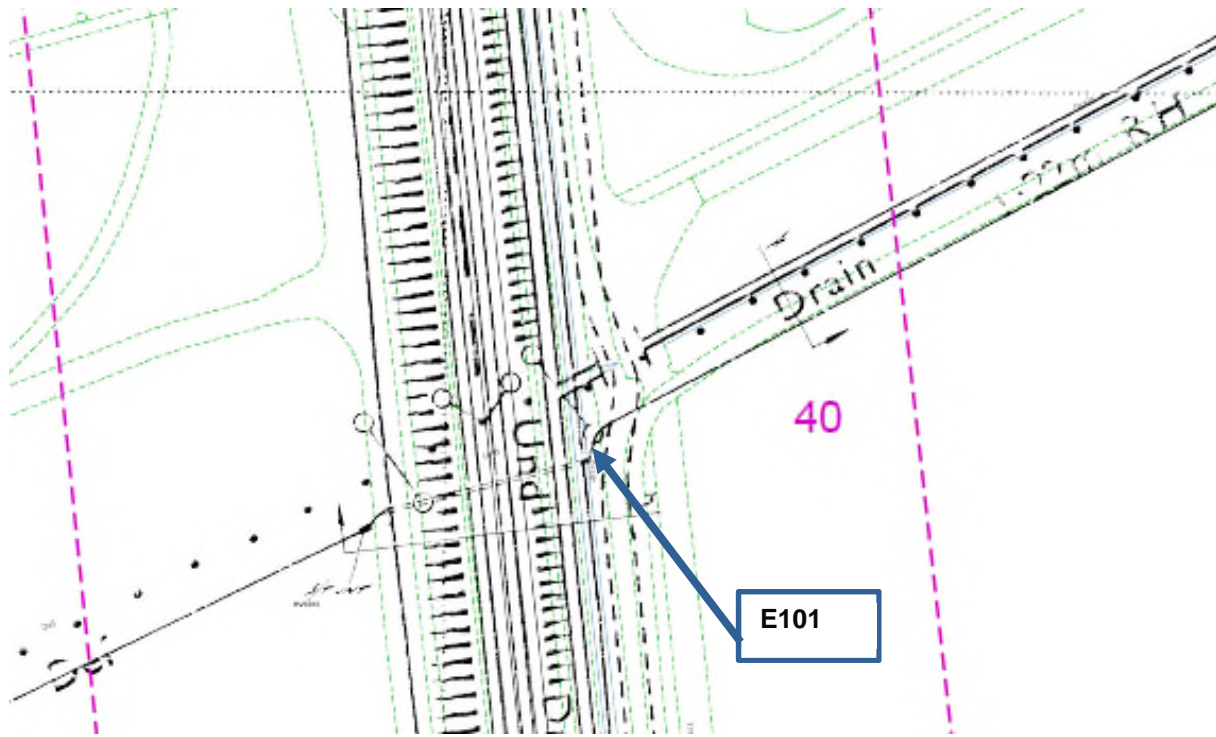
Electric cables in the area surrounding BGK-1544c Nine Wells Bridge and Francis Crick Avenue
